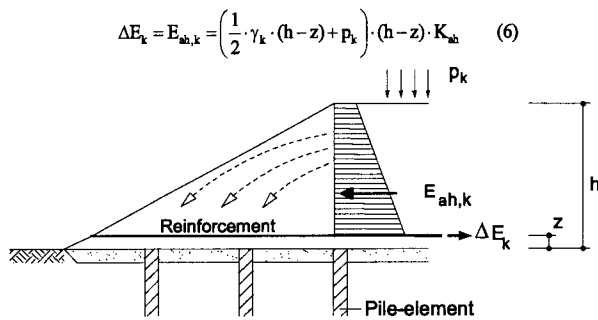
Additional horizontal force in the reinforcement beneath embankment slope (EMPFEHLUNG 6.9, 2003)
